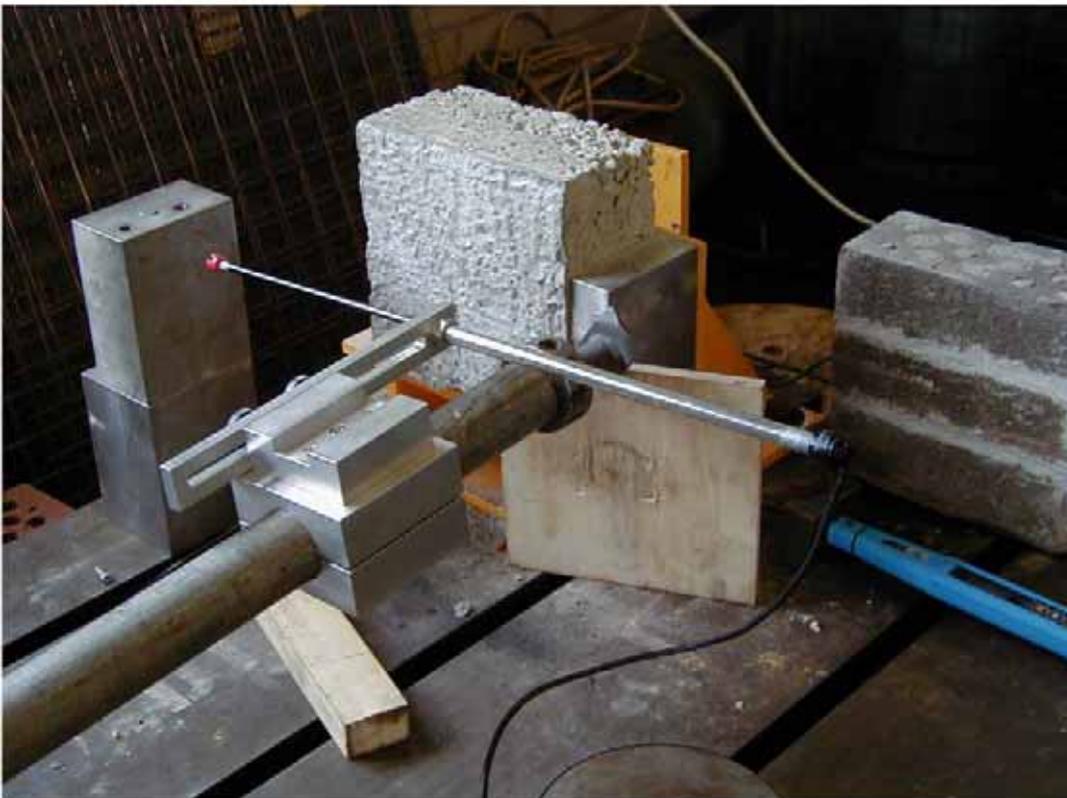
(b) - Reveal Pin Tie Failure, Concrete Reveal, Right Hand Side (Test rp18)
